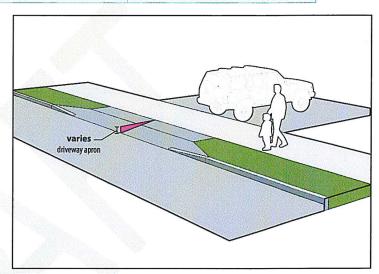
Continuous, level sidewalks across driveways encourage slower speeds and make it easier to create accessible pedestrian routes.
